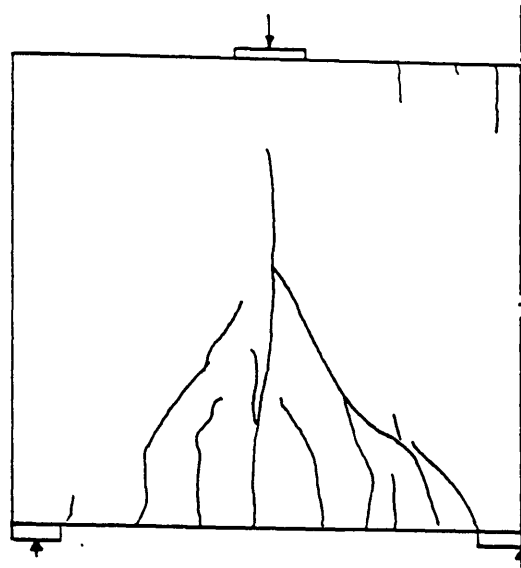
Predicted crack pattern and deformed shape at 1425kN (TRGRAS3)
